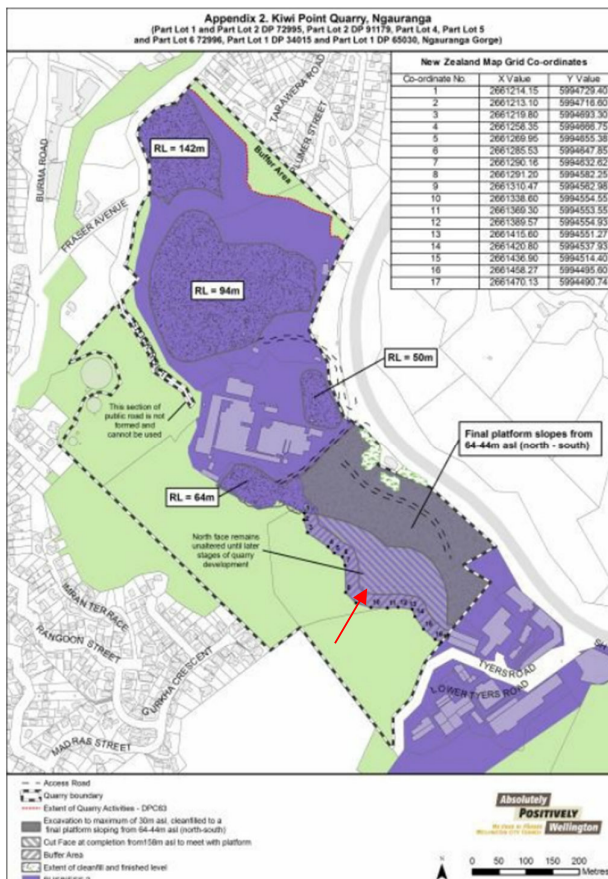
Appendix 2 Kiwi Point Quarry quarrying and cleanfilling plan showing extension area, Ngauranga
